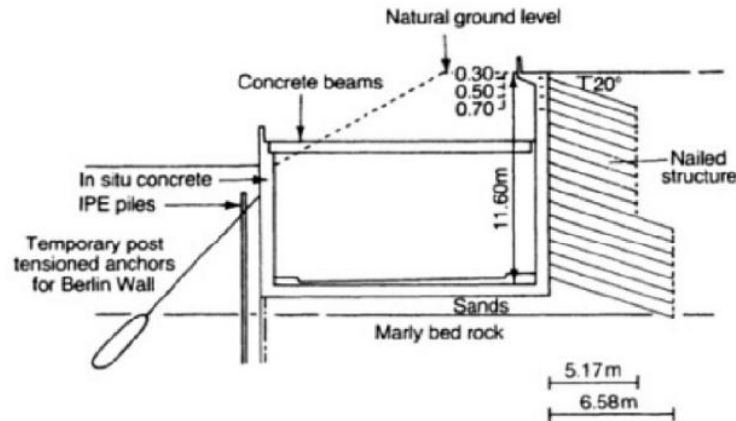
Use of soil nailing in the construction of cut-and-fill tunnel [10]
